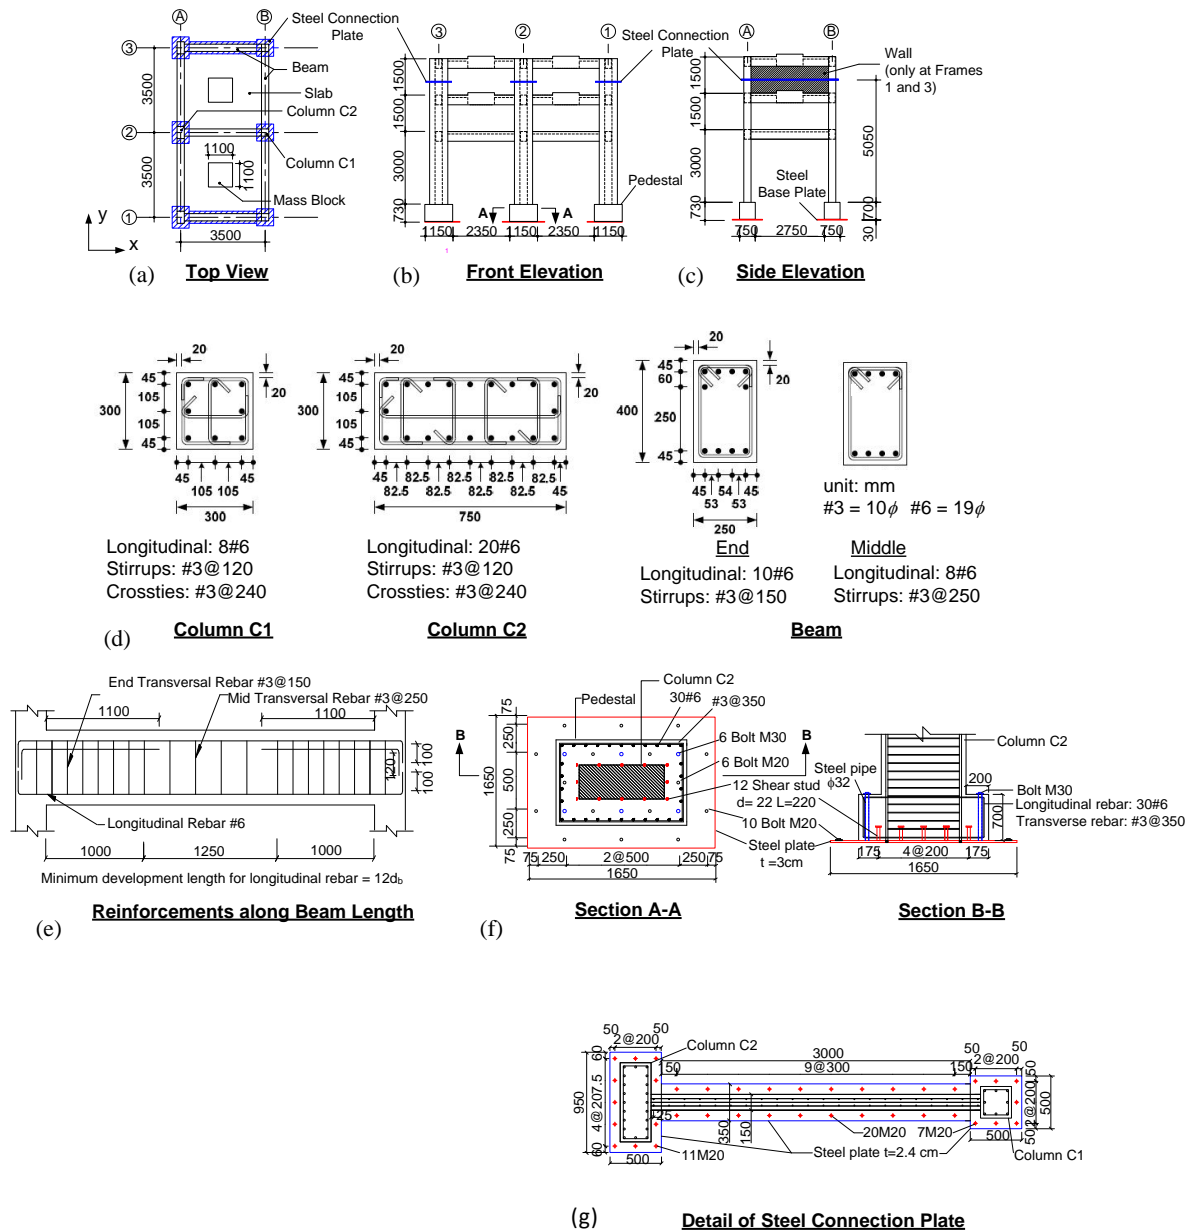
(a) Top view, (b) front elevation, and (c) side elevation of the three-story building; (d) cross sections of beams and columns; (e) reinforcements along beam length; (f) detail of the pedestal; and (g) detail of a steel connection plate.
